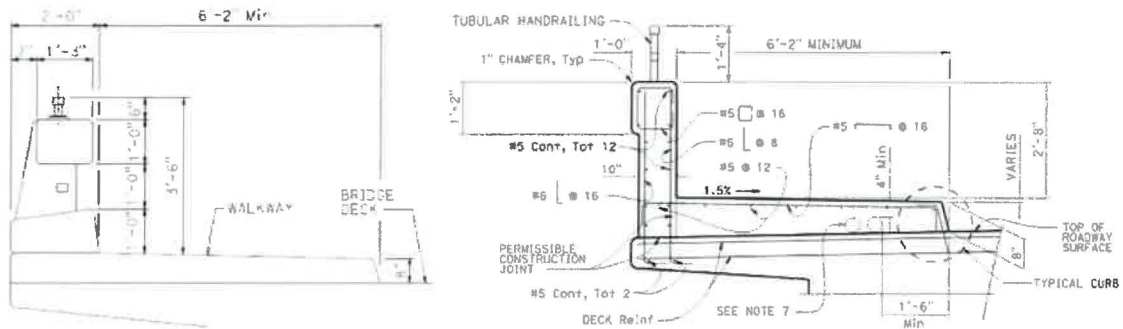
Concrete Barrier Type 85SW (Left) and Type 732SW (Right) Typical Section
